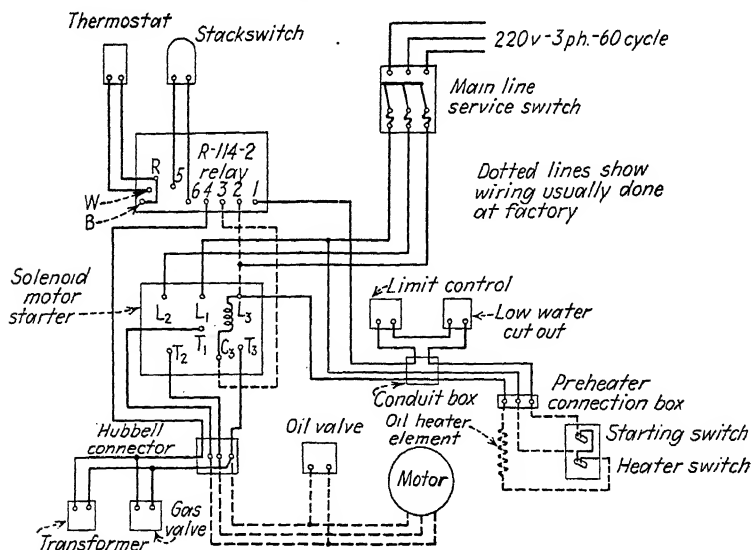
Wiring diagram for three-phase circuit on commercial or industrial oil burner: Minneapolis-Honeywell R-114-2 relay, solenoid motor starter, electric-gas ignition, and electric oil heater with thermostatic regulator and lockout circuit.
